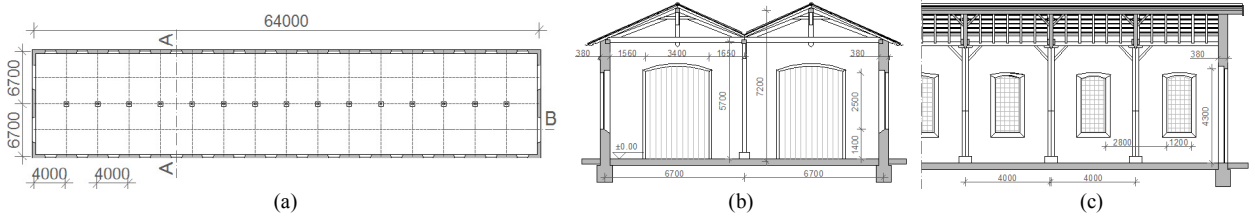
Case study: (a) plan, (b) transversal section A-A and (c) longitudinal section B-B
